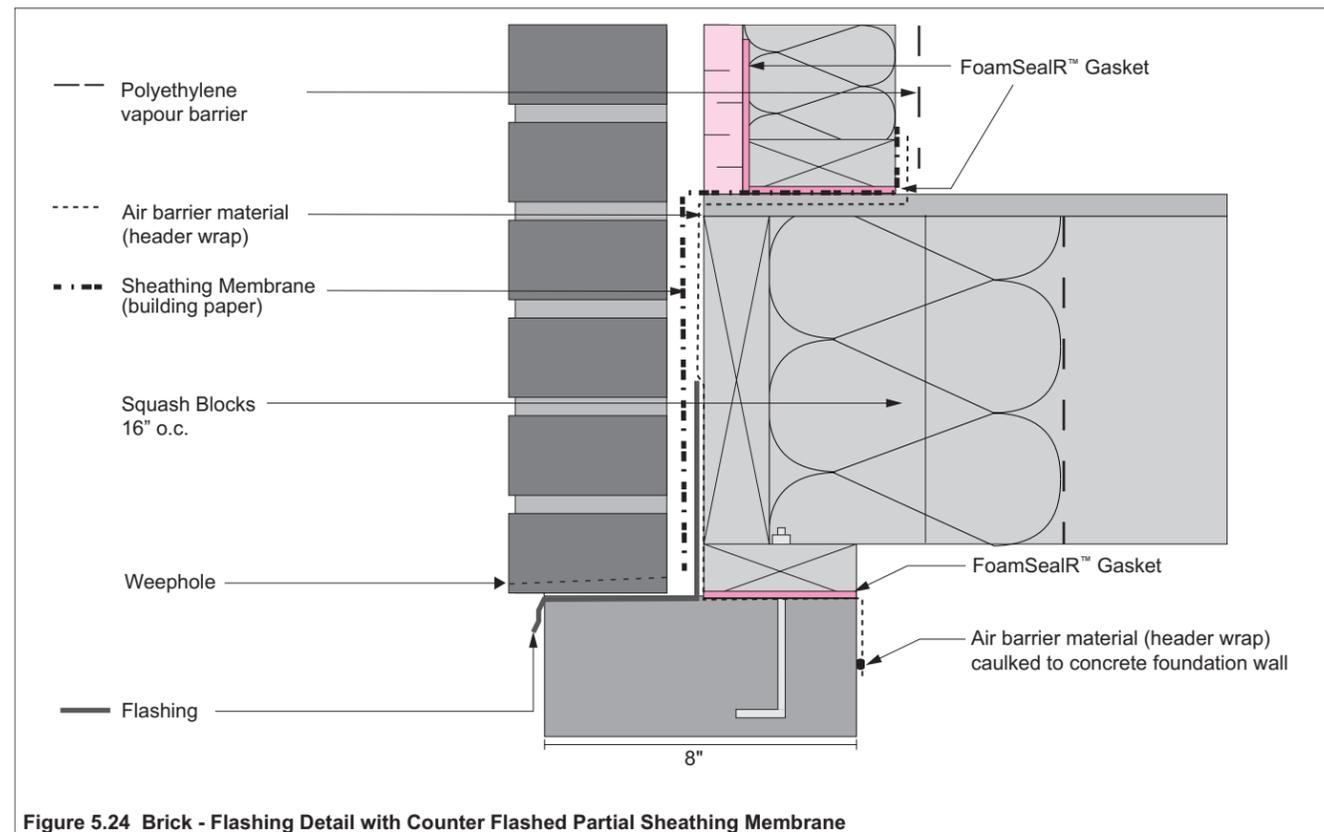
Brick - Flashing Detail with Counter Flashed Partial Sheathing Membrane
